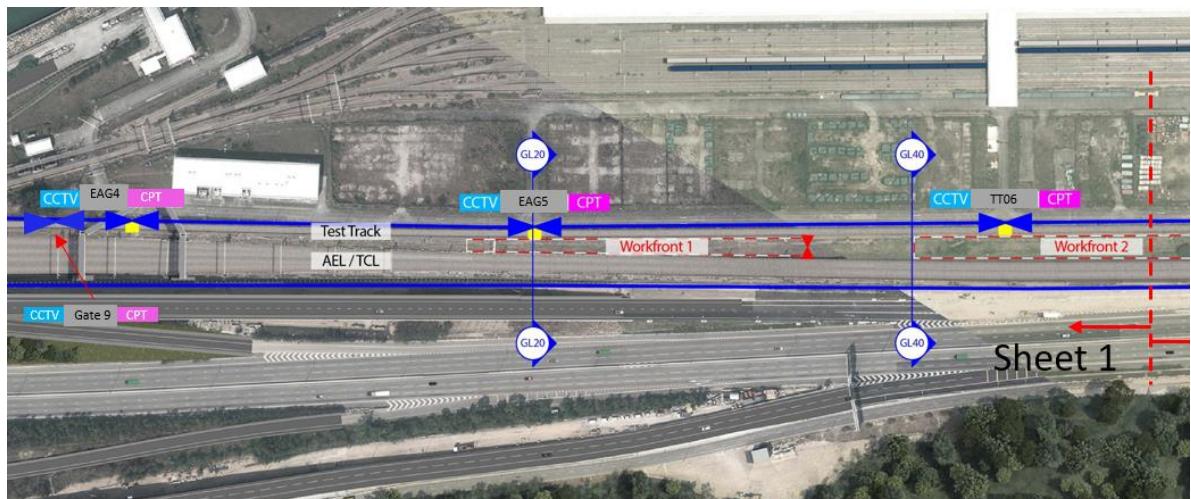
Layout Plan and Grid Line Plan Working Platform at W2
